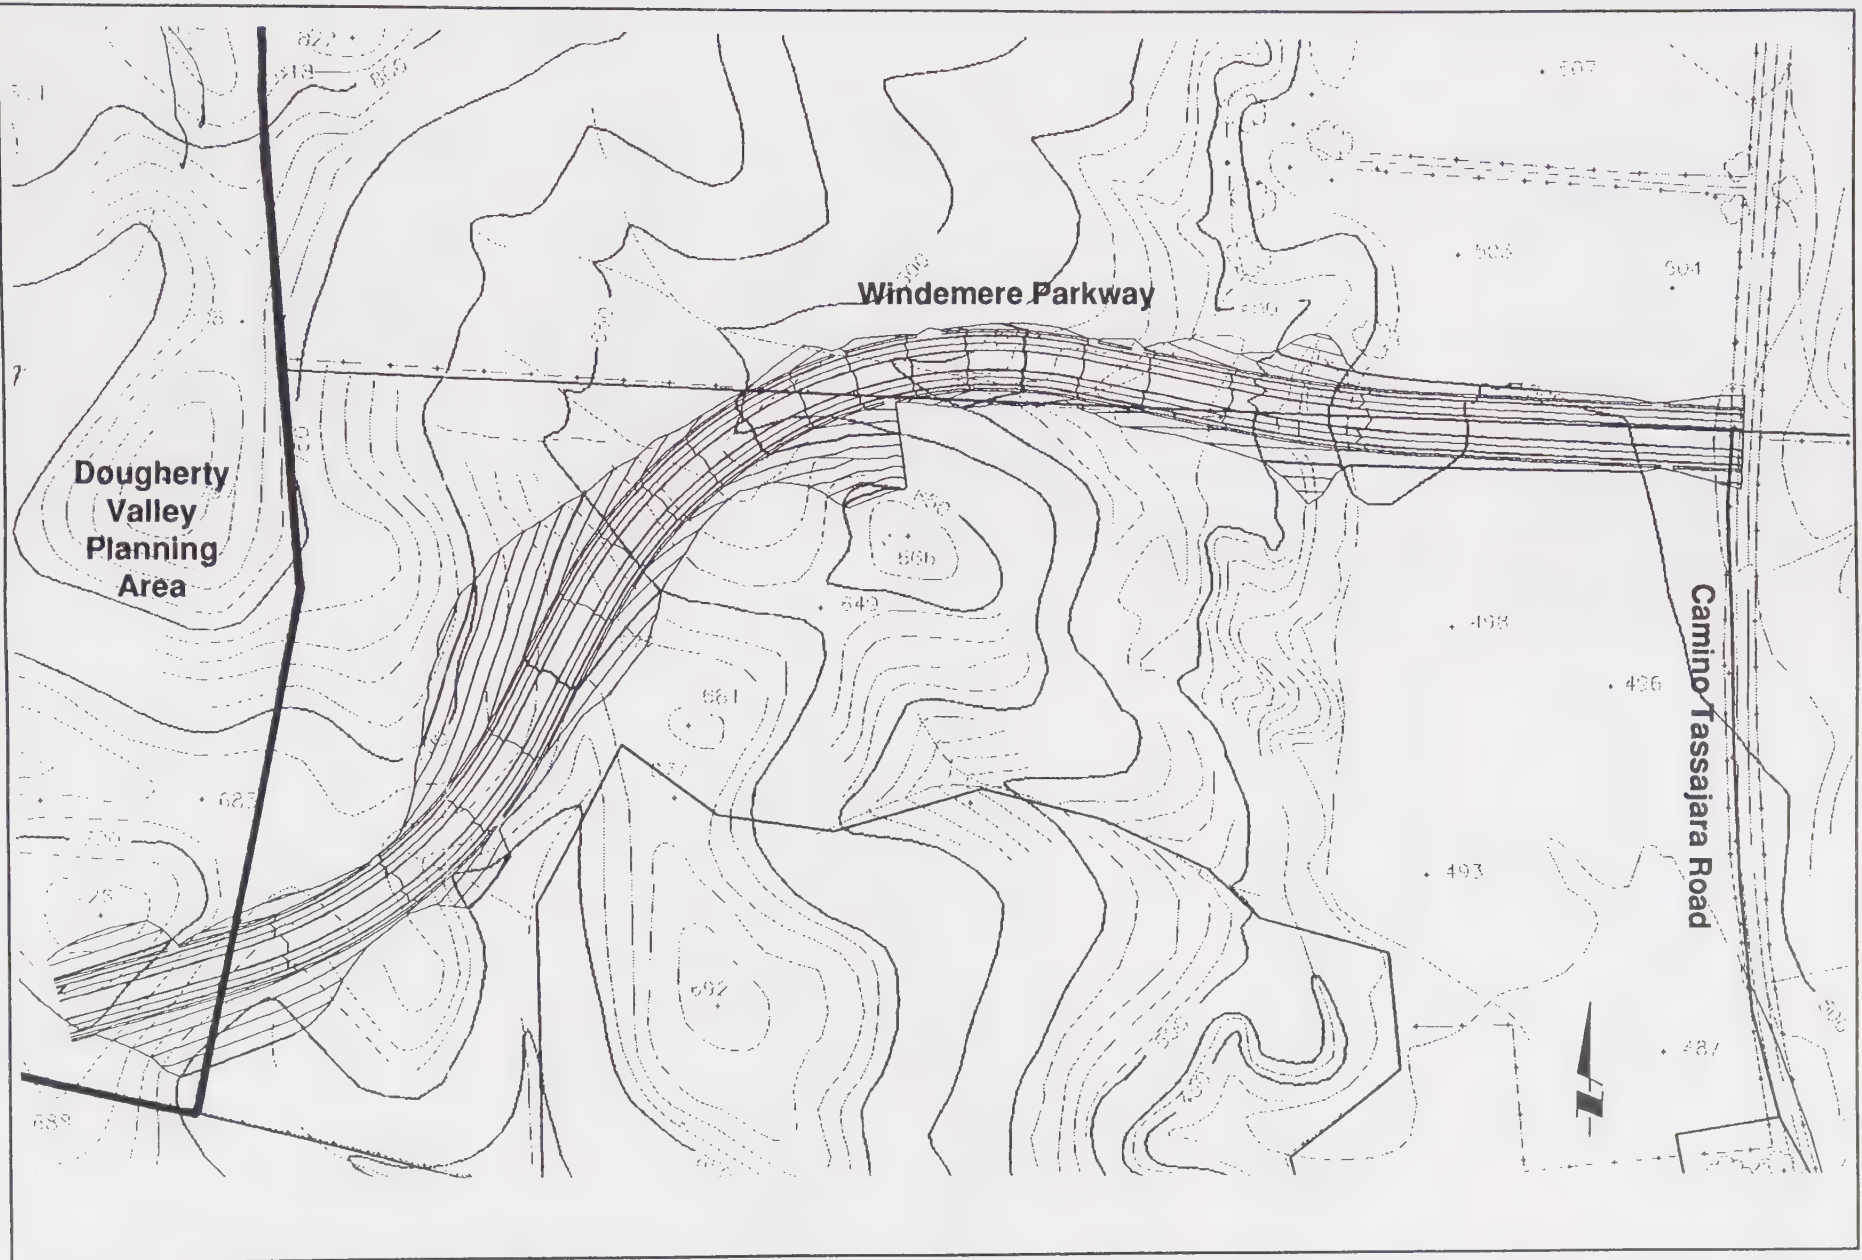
Conceptual Grading Plan for Windemere Parkway Extension
